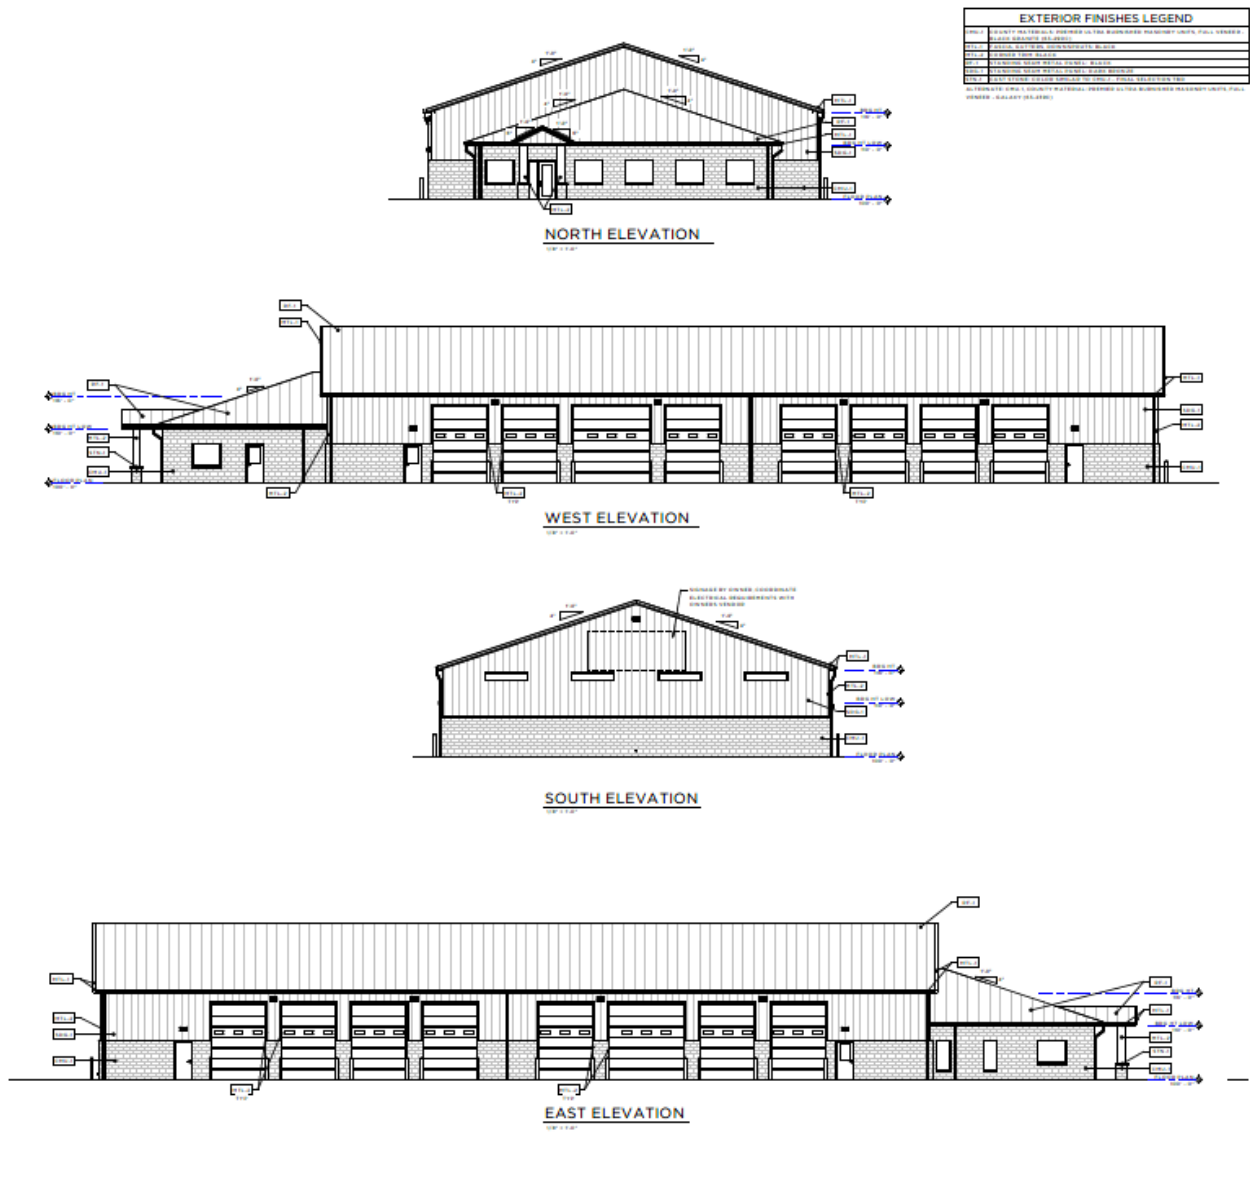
Exhibit C: Description of Project, Final Concept Plan and Site Plan
